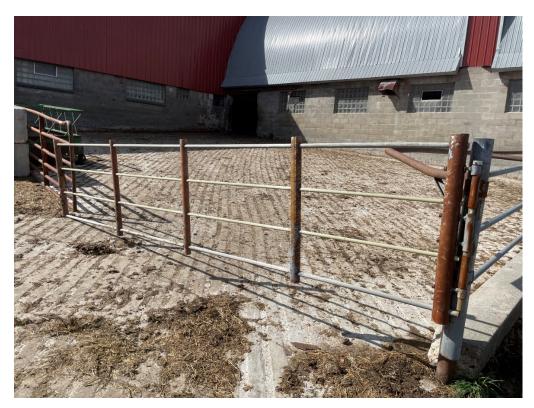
Cattle lane outside of the special needs barn facing southwest.
